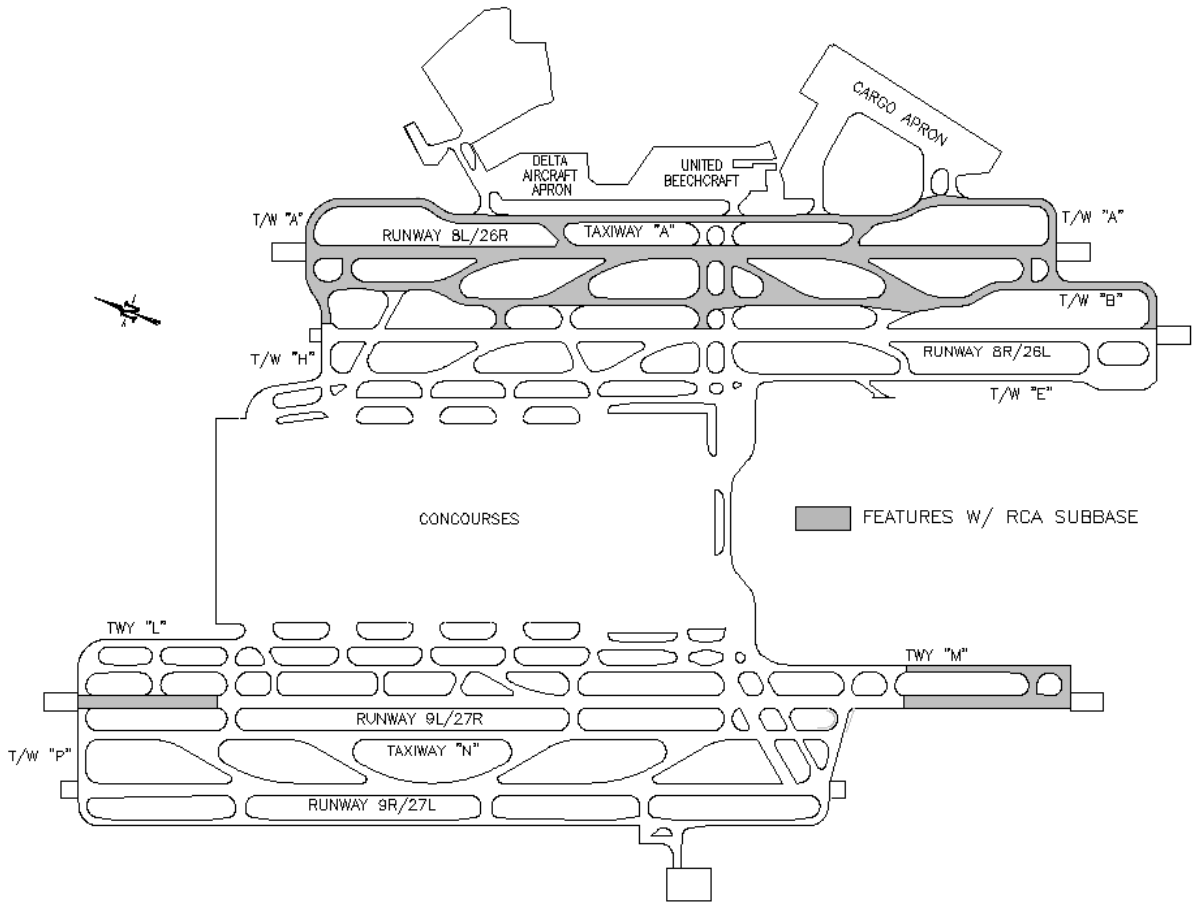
Airfield pavement layout at Hartsfield-Jackson Atlanta airport.
